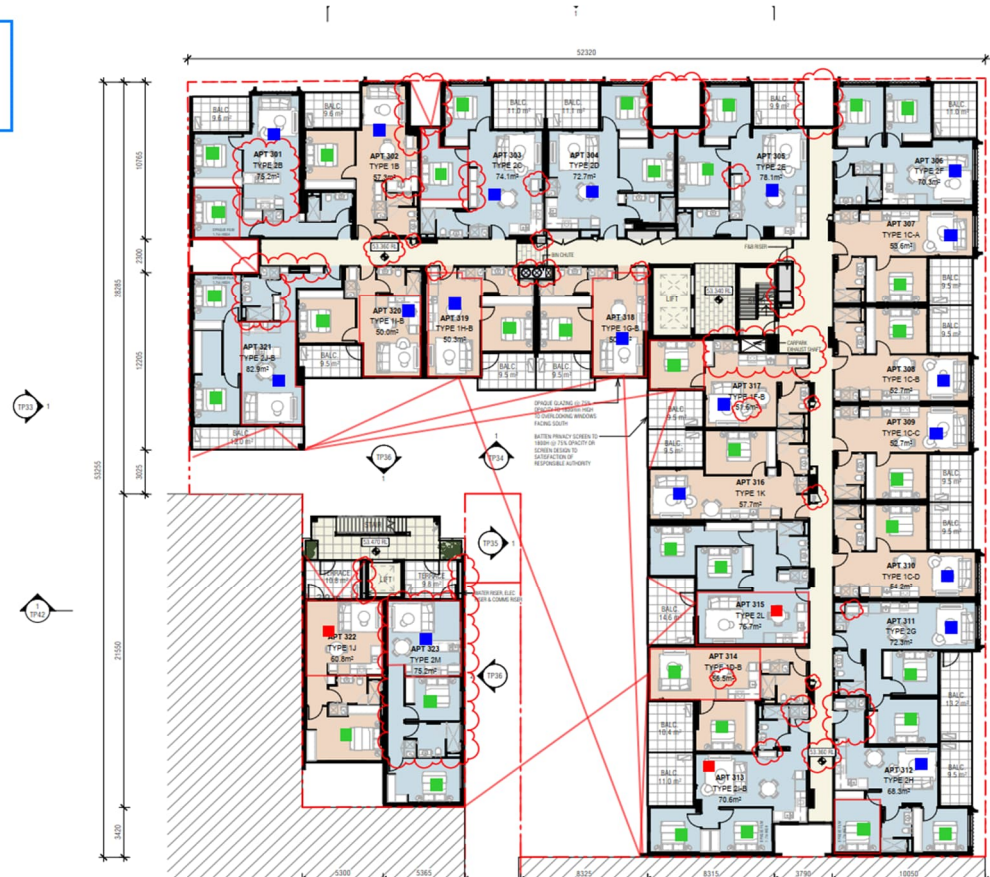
Daylight Access Level 3 – Living Rooms and Bedrooms
